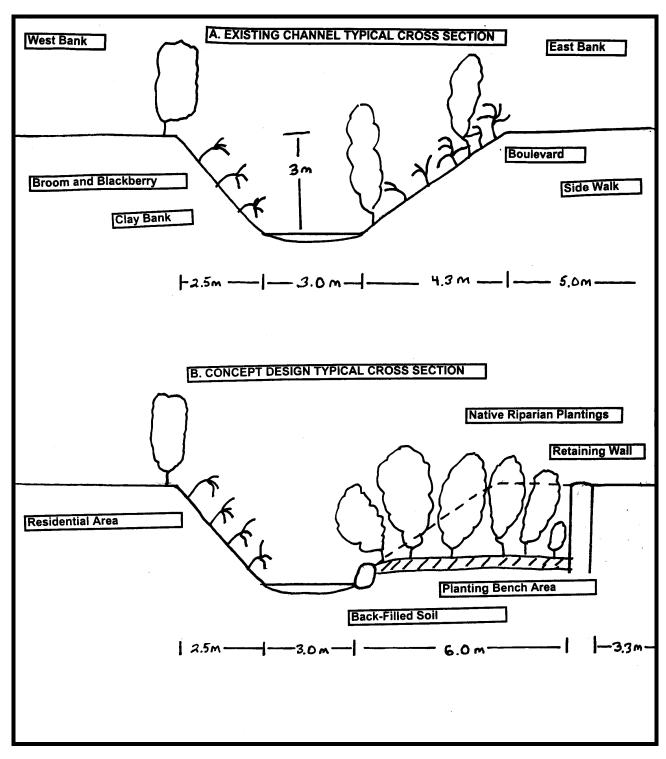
Typical cross section of Bowker Creek in Zone 6 showing concept design for proposed bank reconstruction and riparian restoration work.
